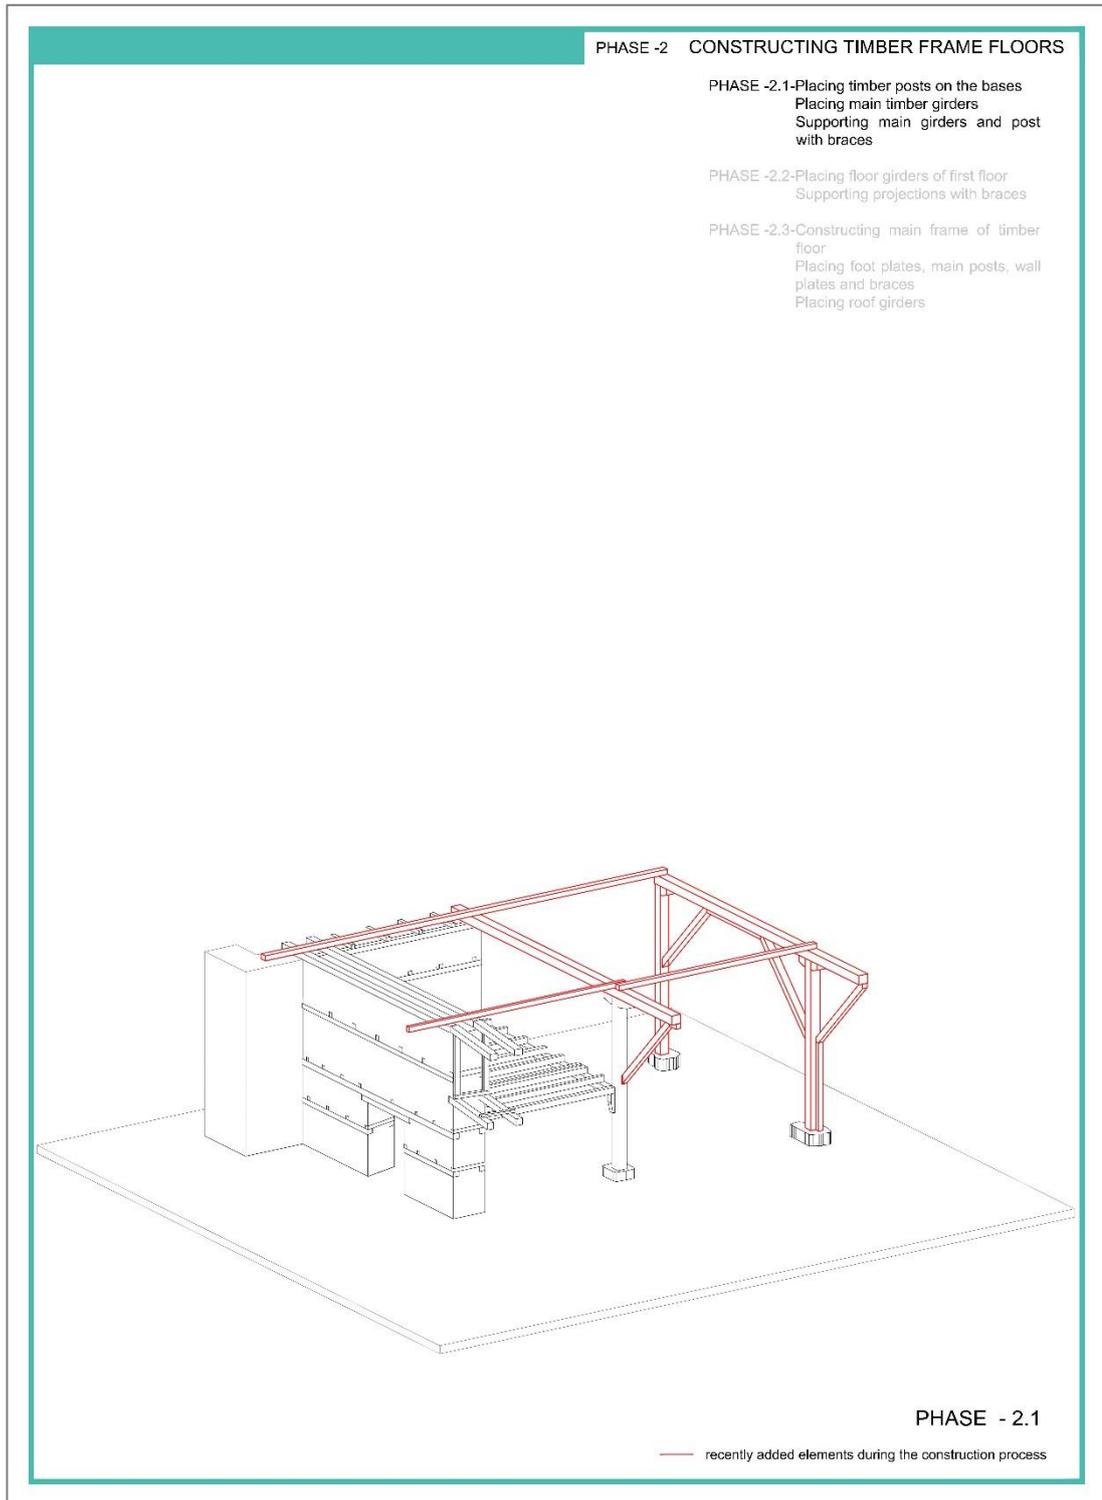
Phase 2.1.- Constructing timber frame floors
